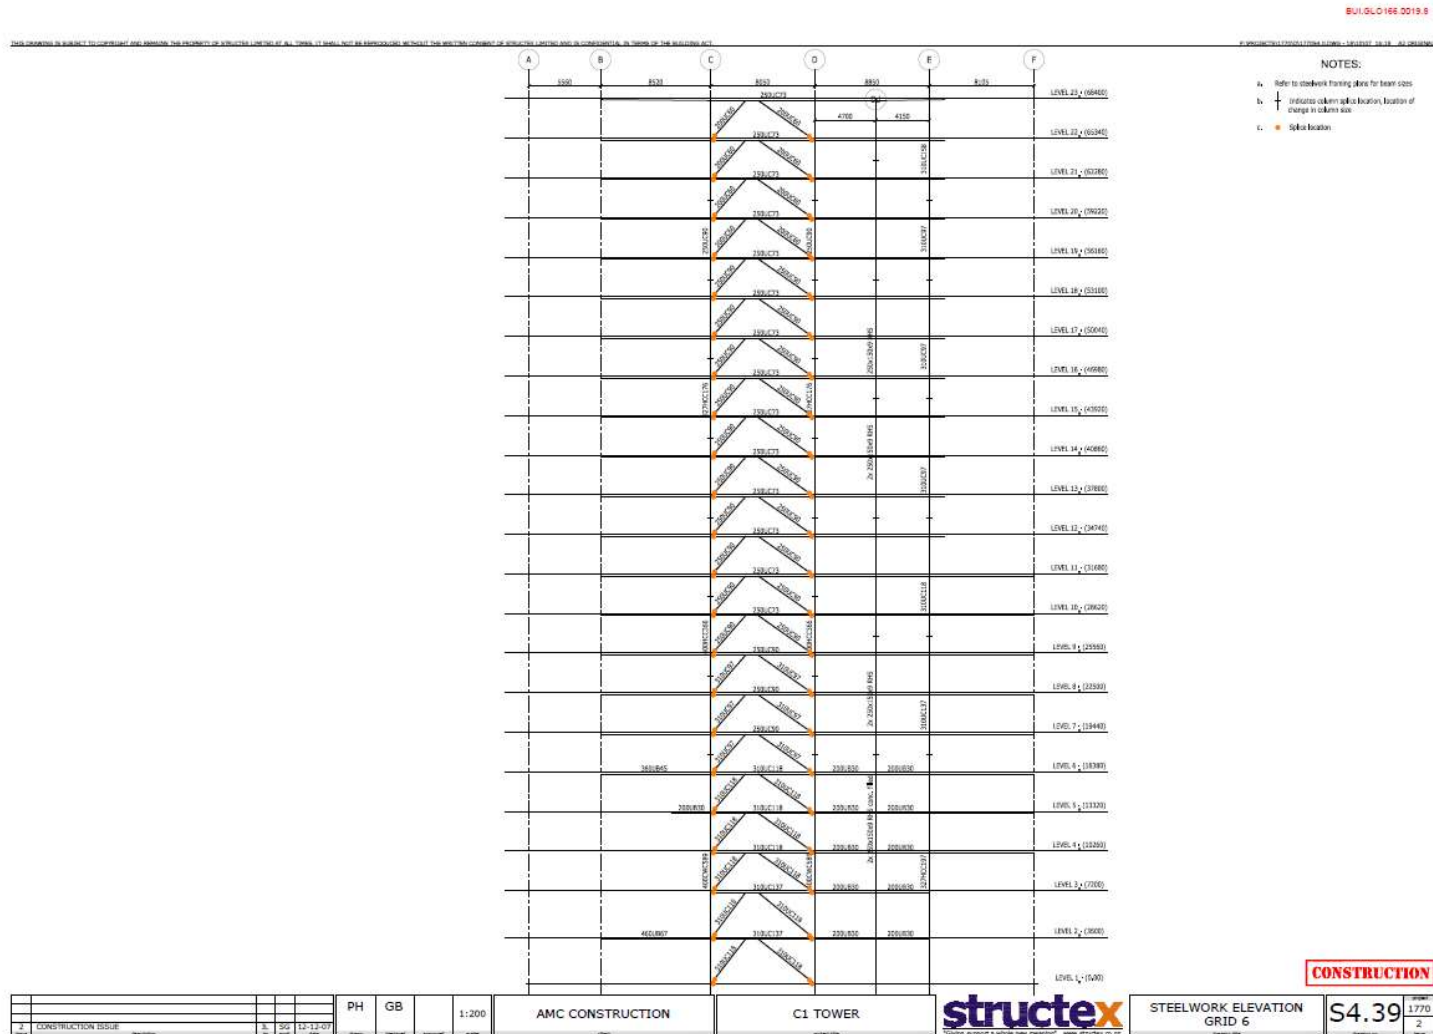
32 Pacific Tower- Elevation View (Grid 6-6) [43]
